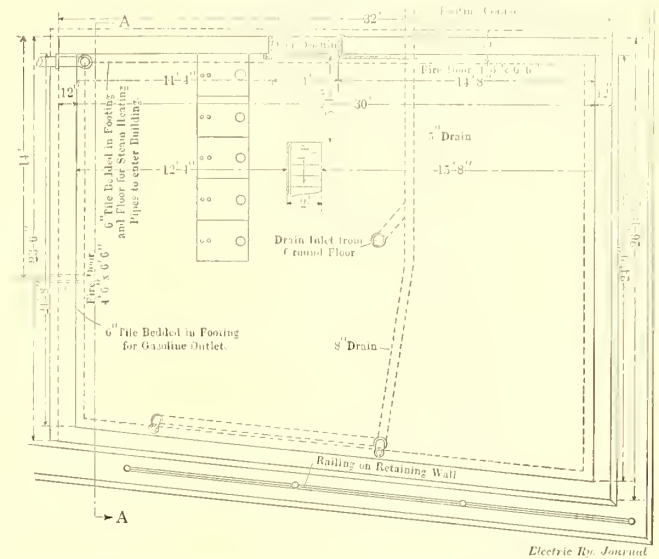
Syracuse Shops—Plan of First Floor of Paint and Oil House
